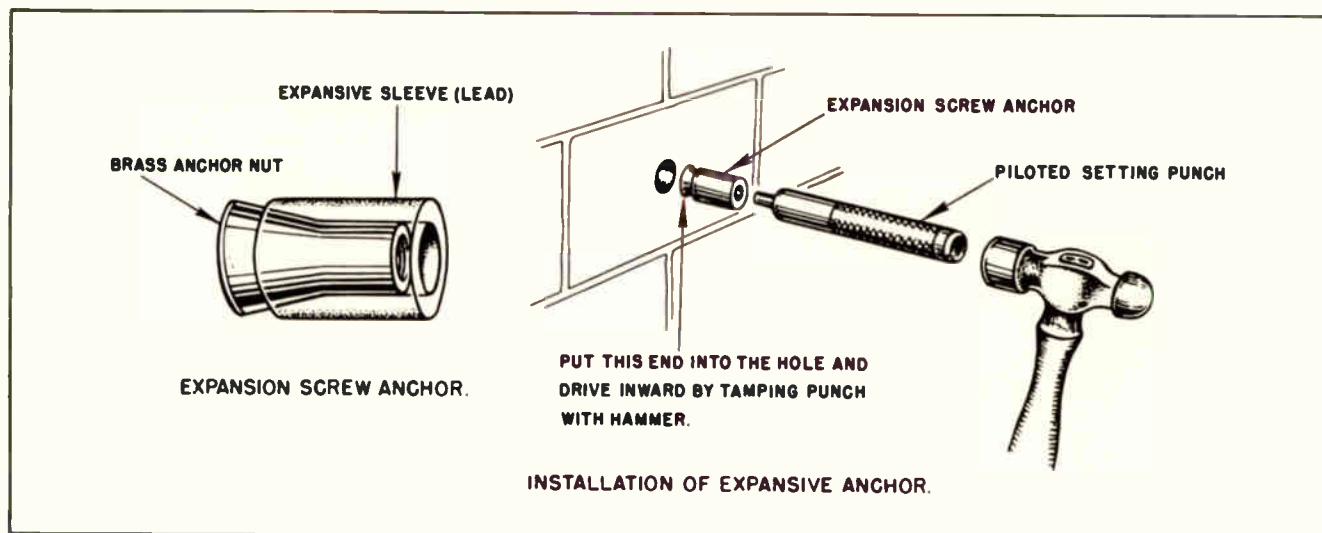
An Ackerman-Johnson Expansion Anchor and its Installation.
